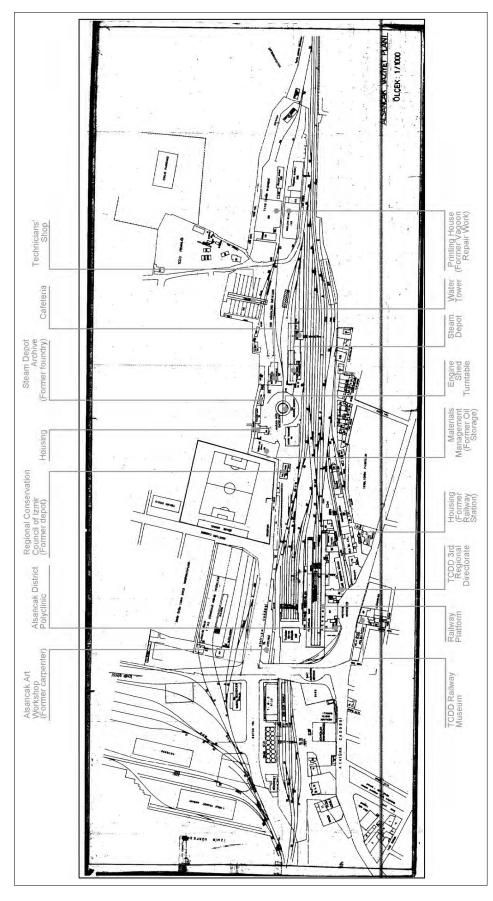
Alsancak Railway Campus with railway buildings (It was prepared by the author on the Alsancak site plan obtained from TCDD 3rd Region Archive.)
